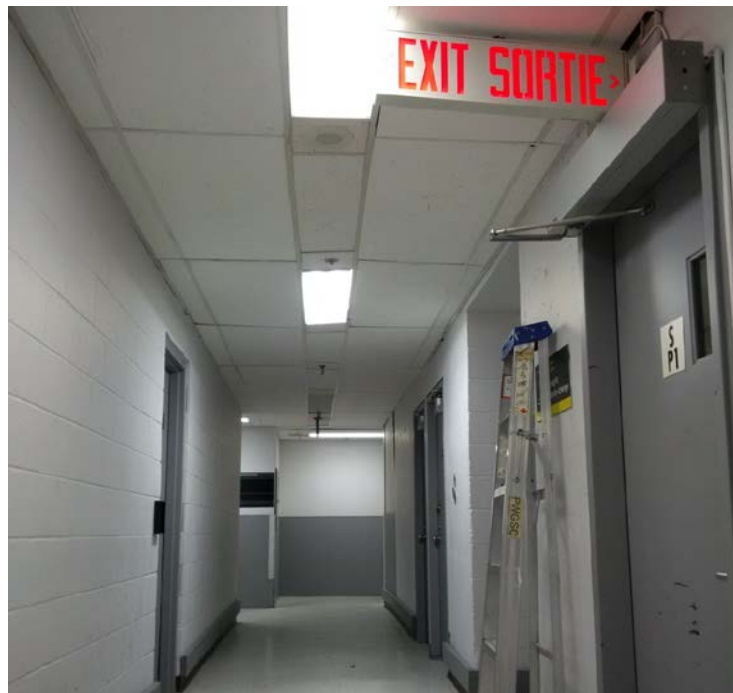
Ceiling stipple on drywall adjacent to elevators does not contain asbestos. Drywall joint compound under stipple does contain asbestos.
